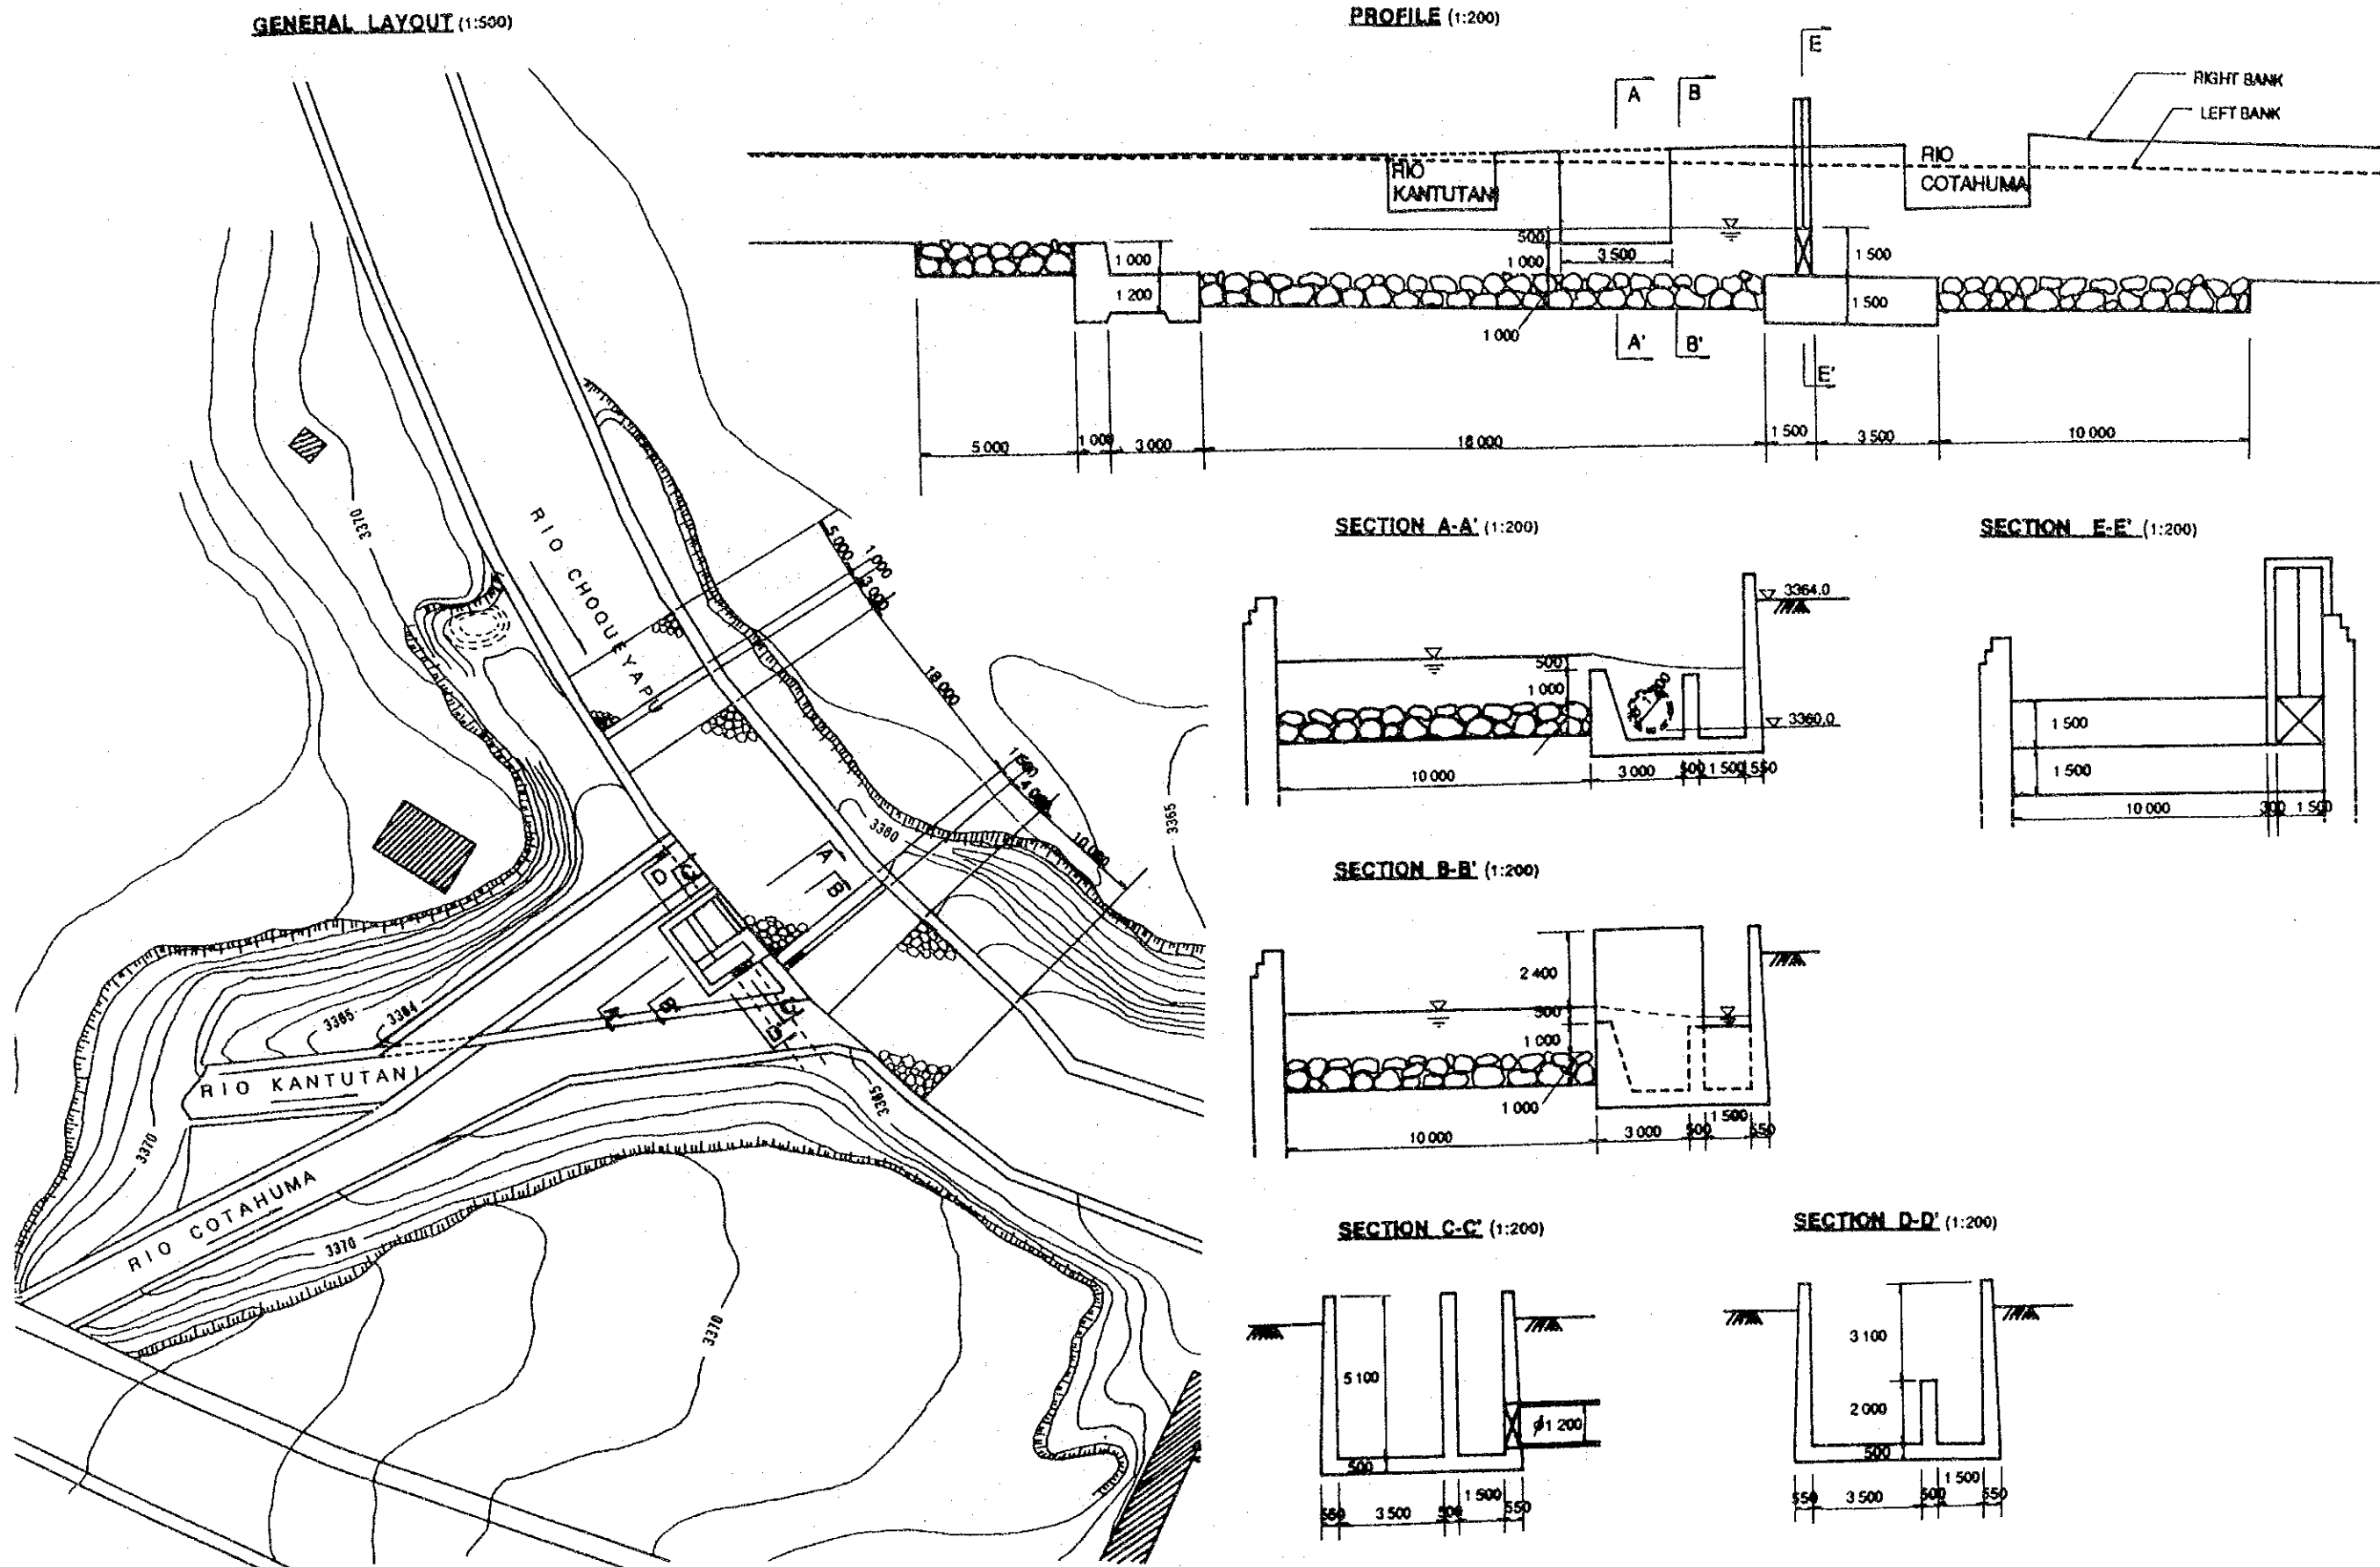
GENERAL LAYOUT AND PROFILES OF WATER INTAKE FACILITIES
